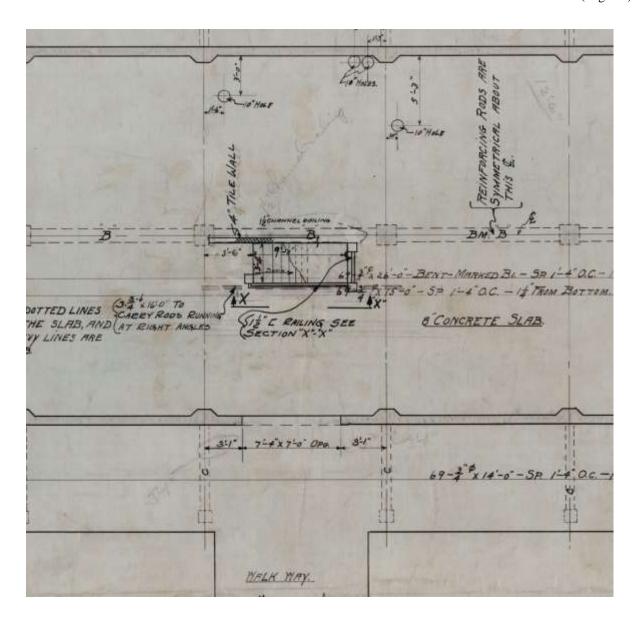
Detail of *Pumping Station, Club-Room Plan and Details* (AES, Drawing No. 5311, 29 June 1920). This plan illustrates the redesigned stairway to the Pump Floor. These stairs, which were reversed from their original configuration, were a straight run without landing that began on the west side of the stair opening.
